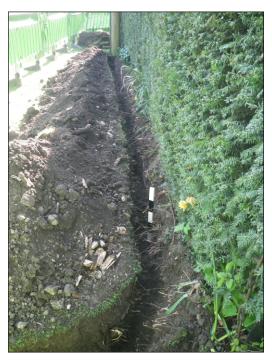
Southern section of trench from support pole to road; garden soil (03)
